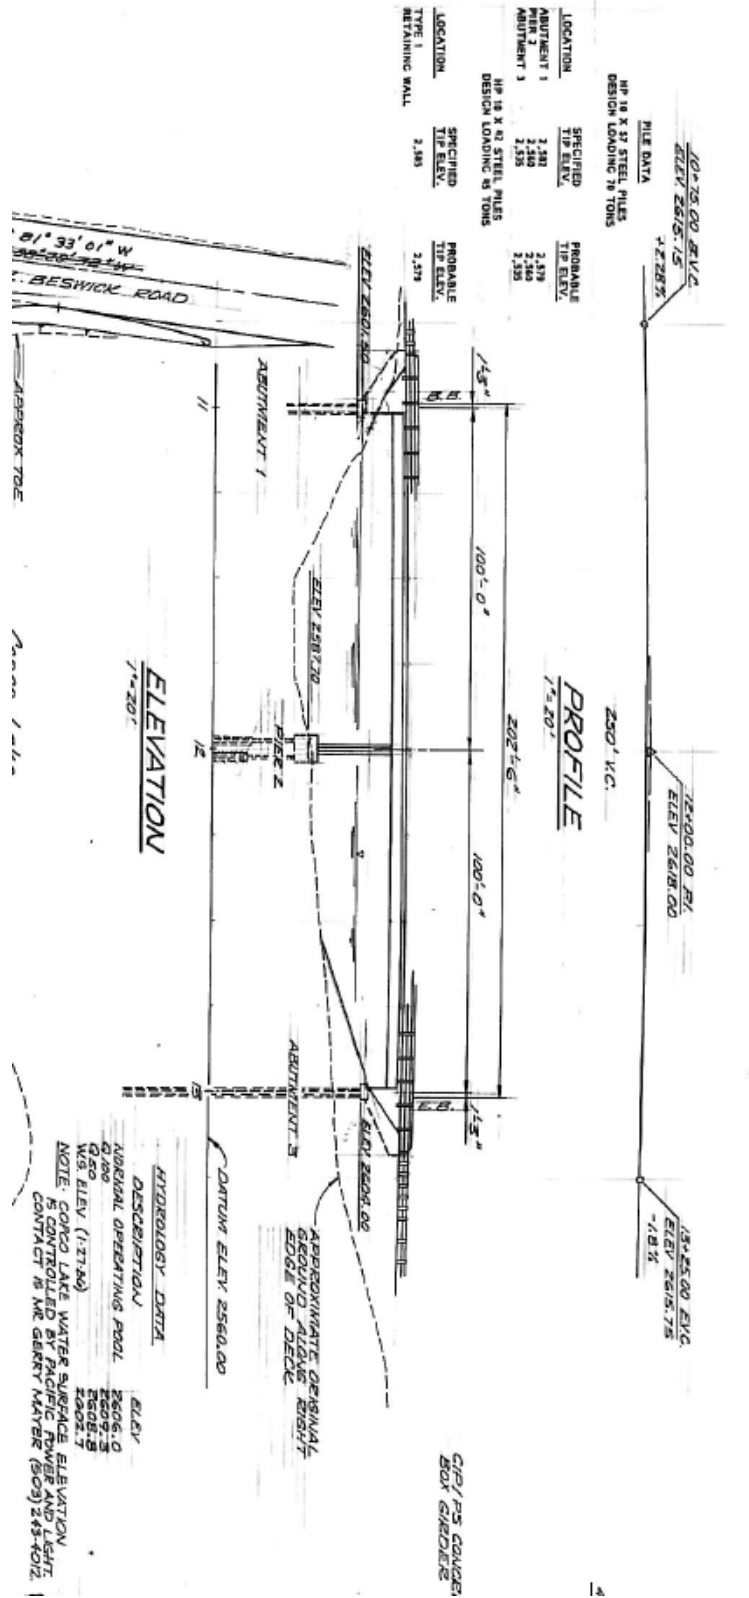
Pier elevations at Copco Bridge in upstream of Copco Reservoir.
